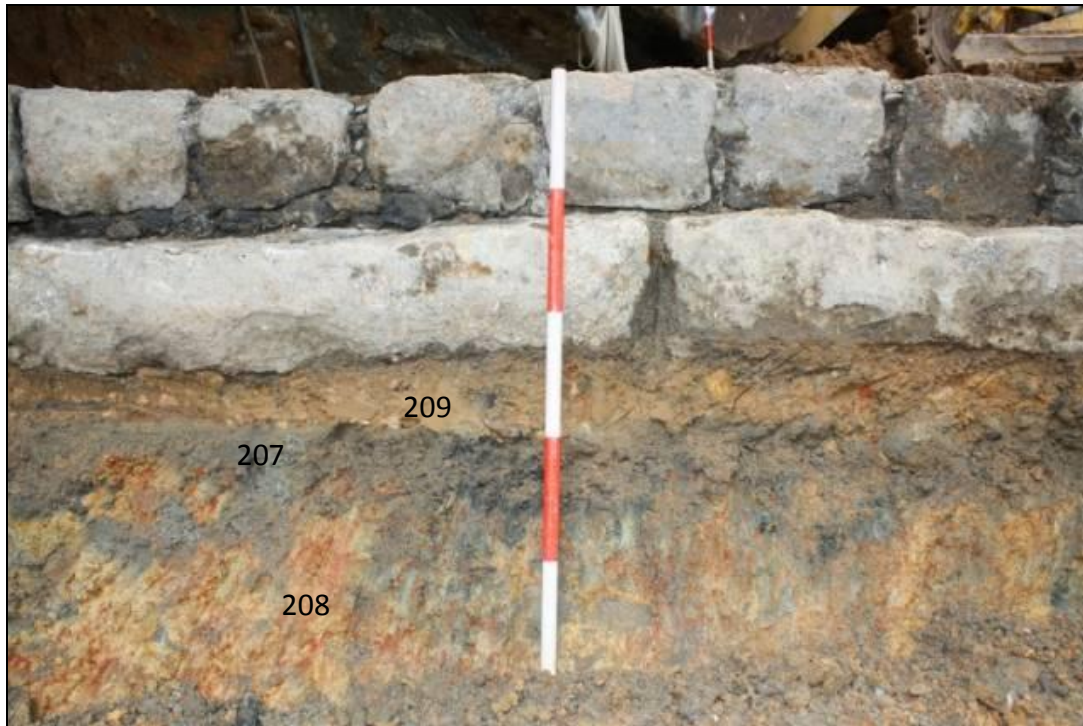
Seawall foundation: two foundation rows and stratigraphy below: sterile orangy layer, co.209 over a grey sandy layer,co. 207 and both sitting on a sterile natural soil, co.208
